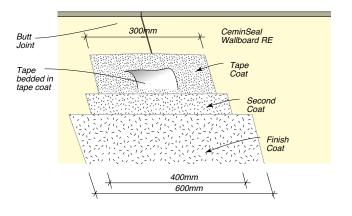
Flush-Set Jointing – Internal System Butt Joint. (Refer to the JOINTING section in this guide for more detailed information)
